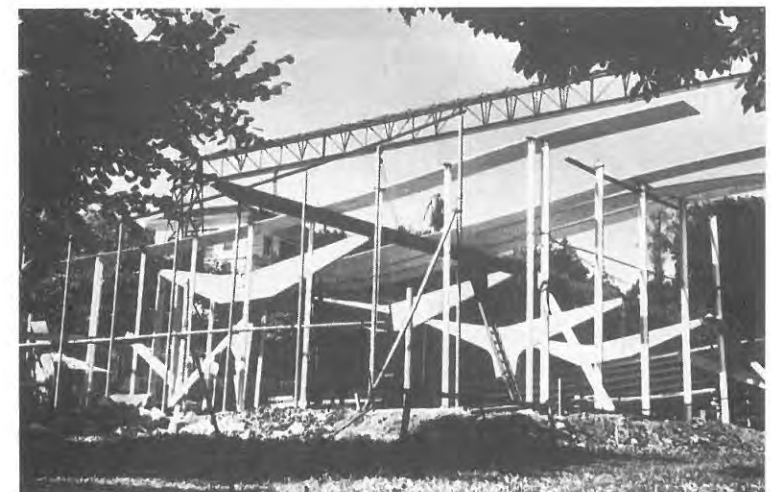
Pump Room, Evian (Haute-Savoie), 1956. Jean Prouvé with Maurice Novarina, architect. Building under construction. (© Centre Pompidou, Bibliothèque Kandinsky)
